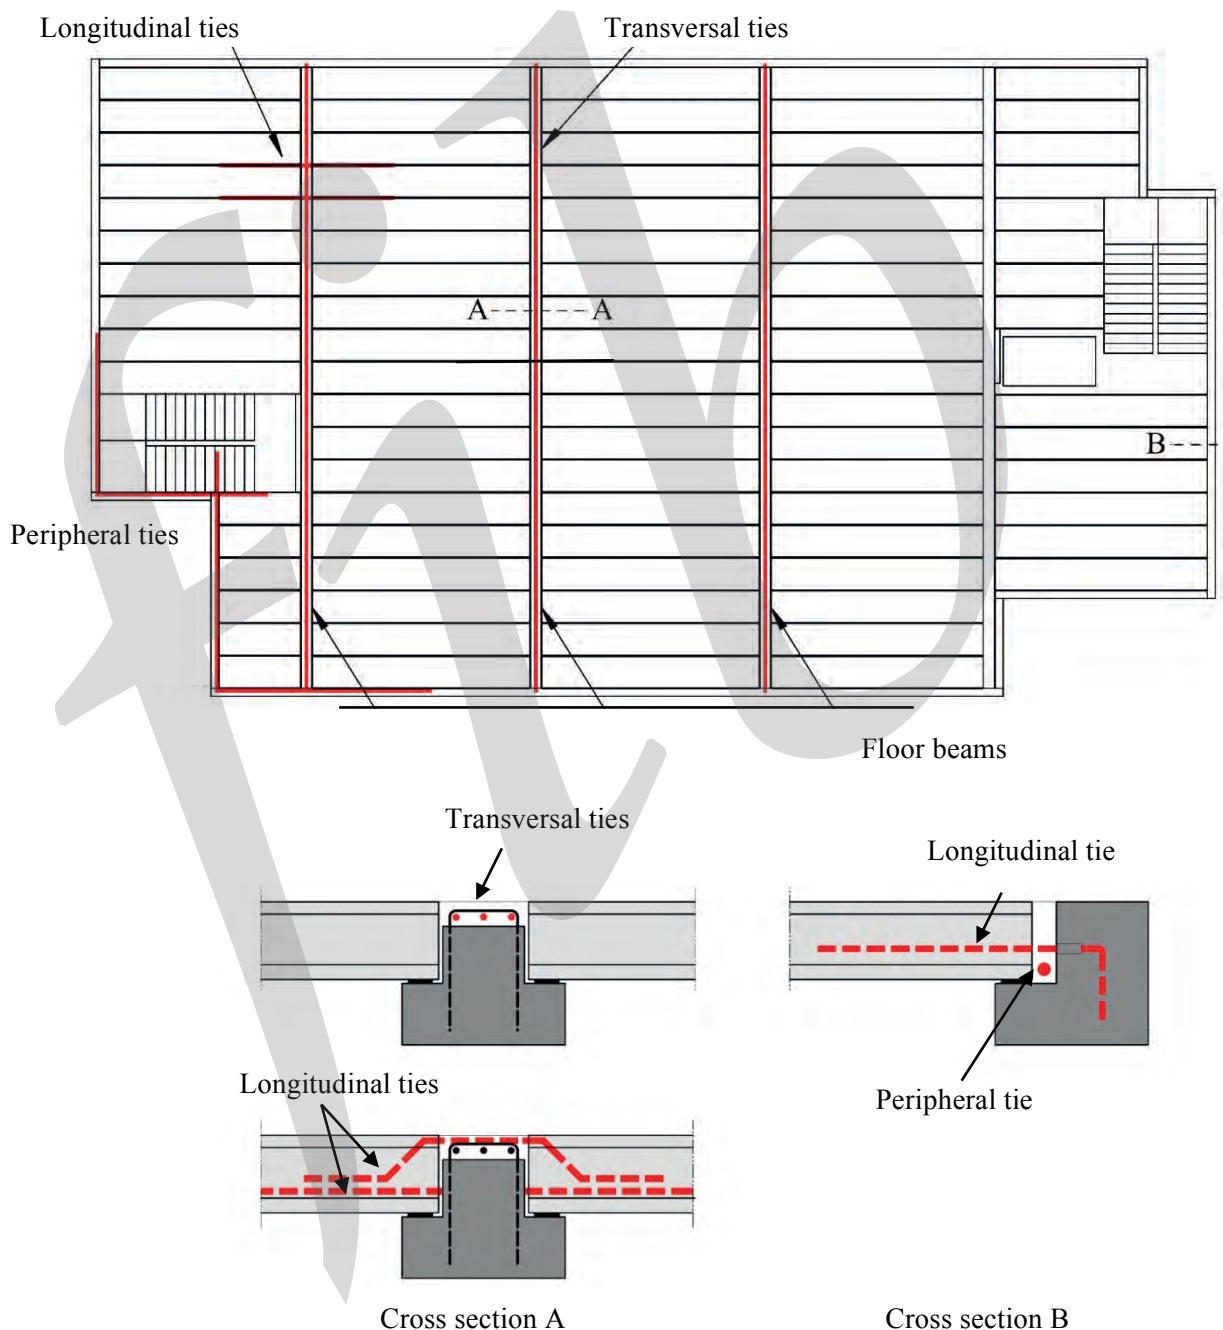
Location of horizontal floor ties. The drawing on left under shows two types of longitudinal ties over the support, either through a hole in the beam, or over the top of the beam into the floor.
